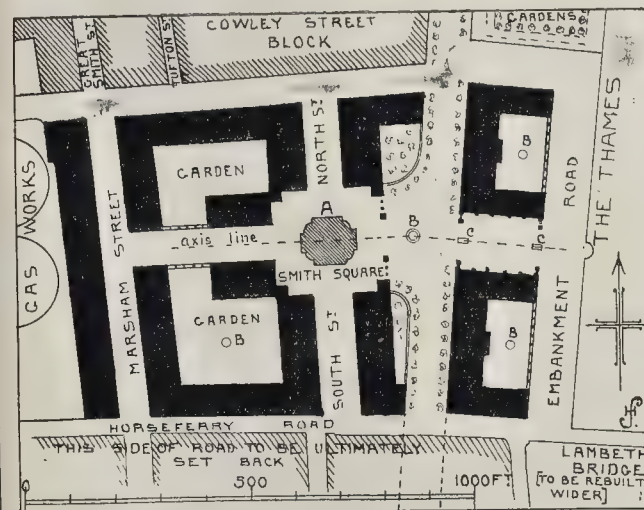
Suggested Plan for arrangement of the southern portion of Proposed Building Site, opening out St. John's Church to the River and to the new streets. By the Editor.
